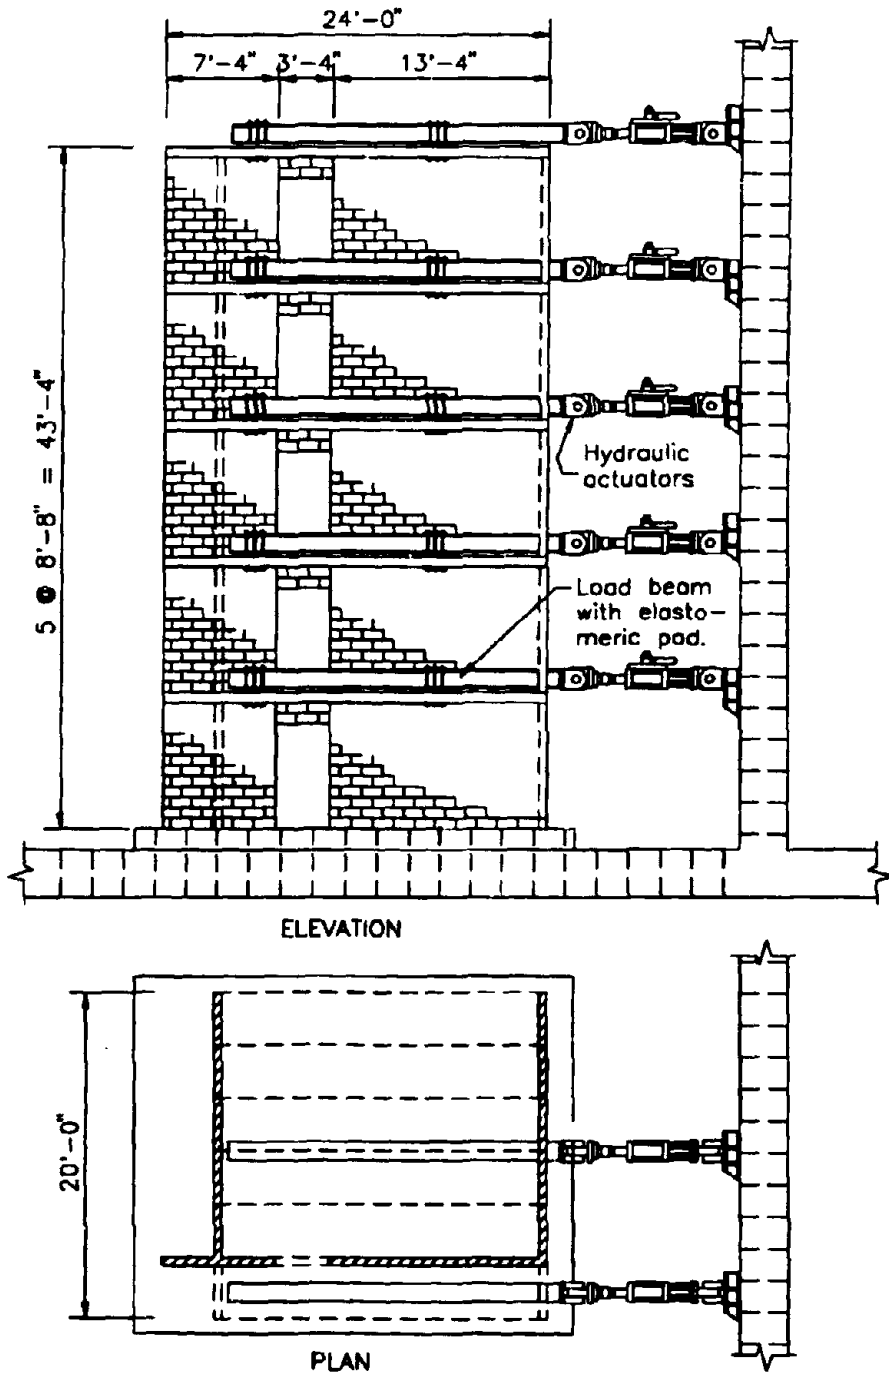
5-Story Reinforced Masonry Research Building, Plan and Elevation
